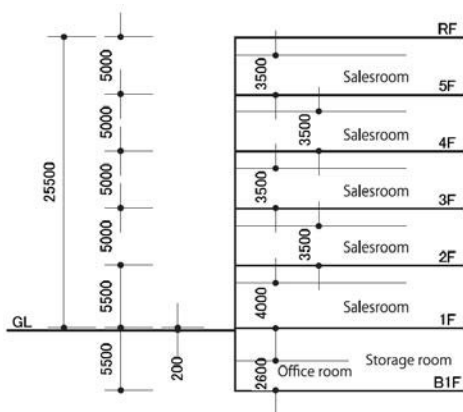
Model building (department store, 5 000 m²) section 1/200
